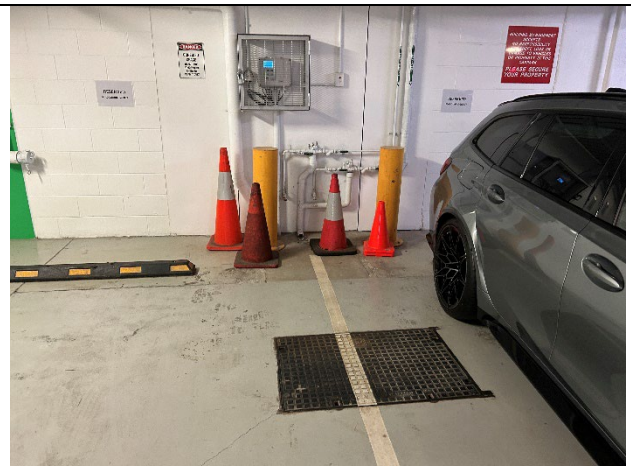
Level B2, carpark, adjacent spaces 15 and 16, sewer pit.
